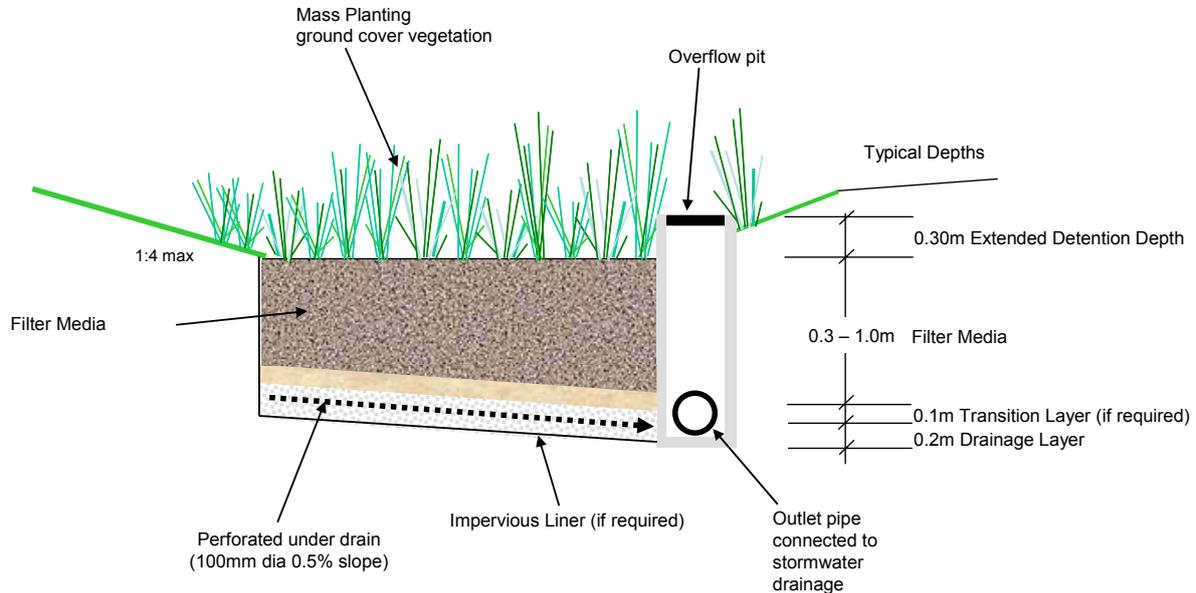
B: Typical Cross Section of a Bioretention Basin
